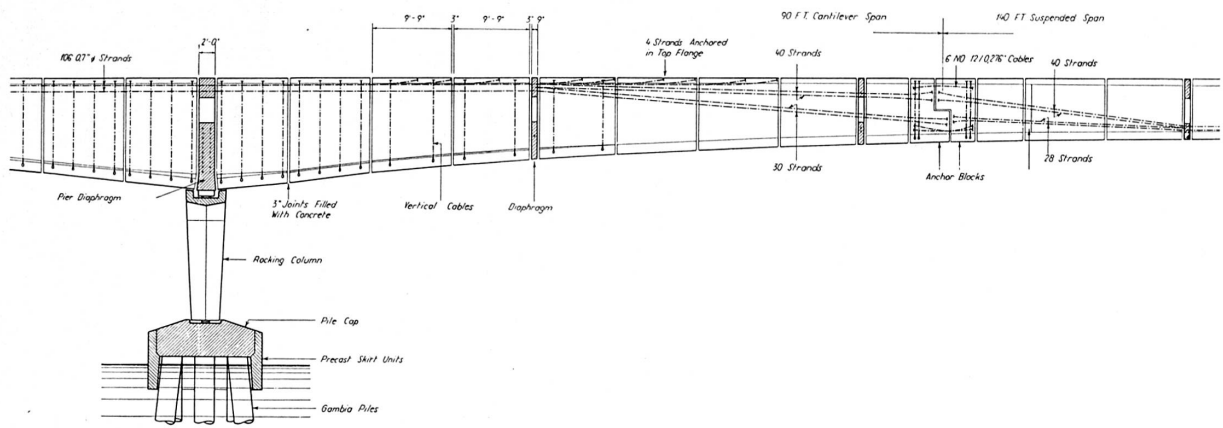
Sectional Elevation of Main. Beam at River Pier.
